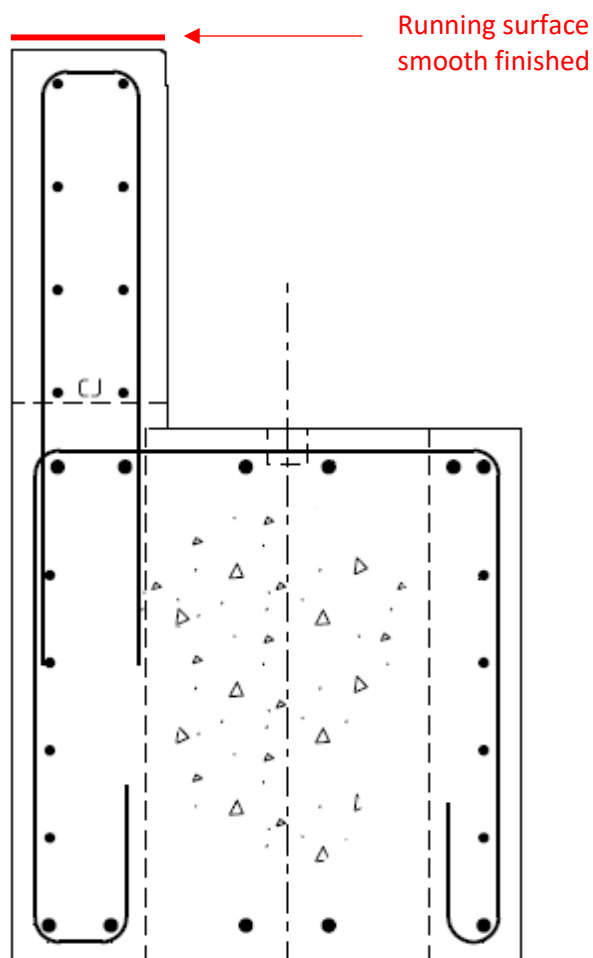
Roughness of curtain wall (RMS [annotated], 2016)
